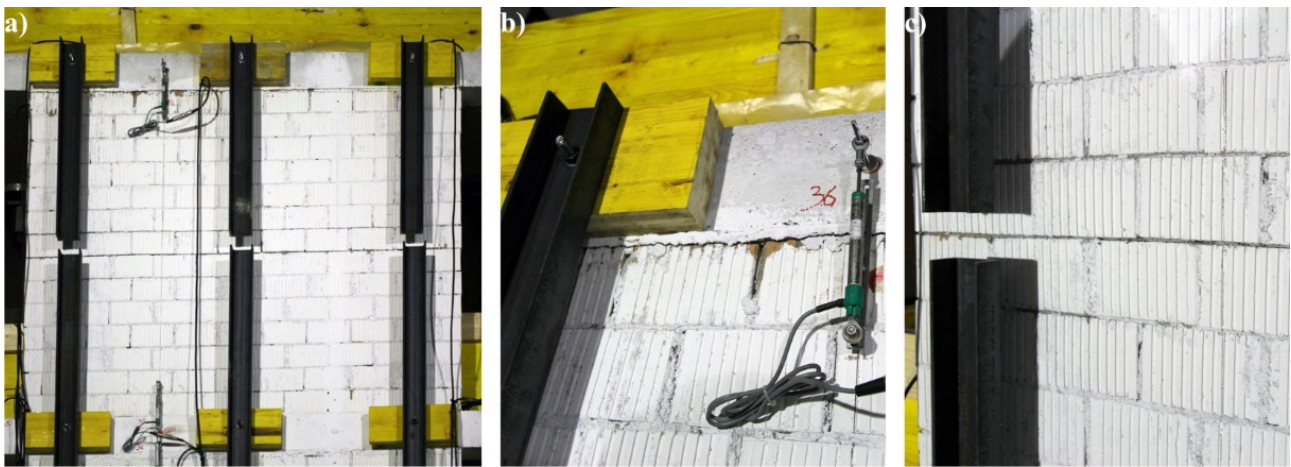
Damage in the 4<sup>th</sup> storey out-of-plane loaded wall on the North side of the structure: a) full wall view, b) detail of the top crack and c) detail of the mid-height crack.
